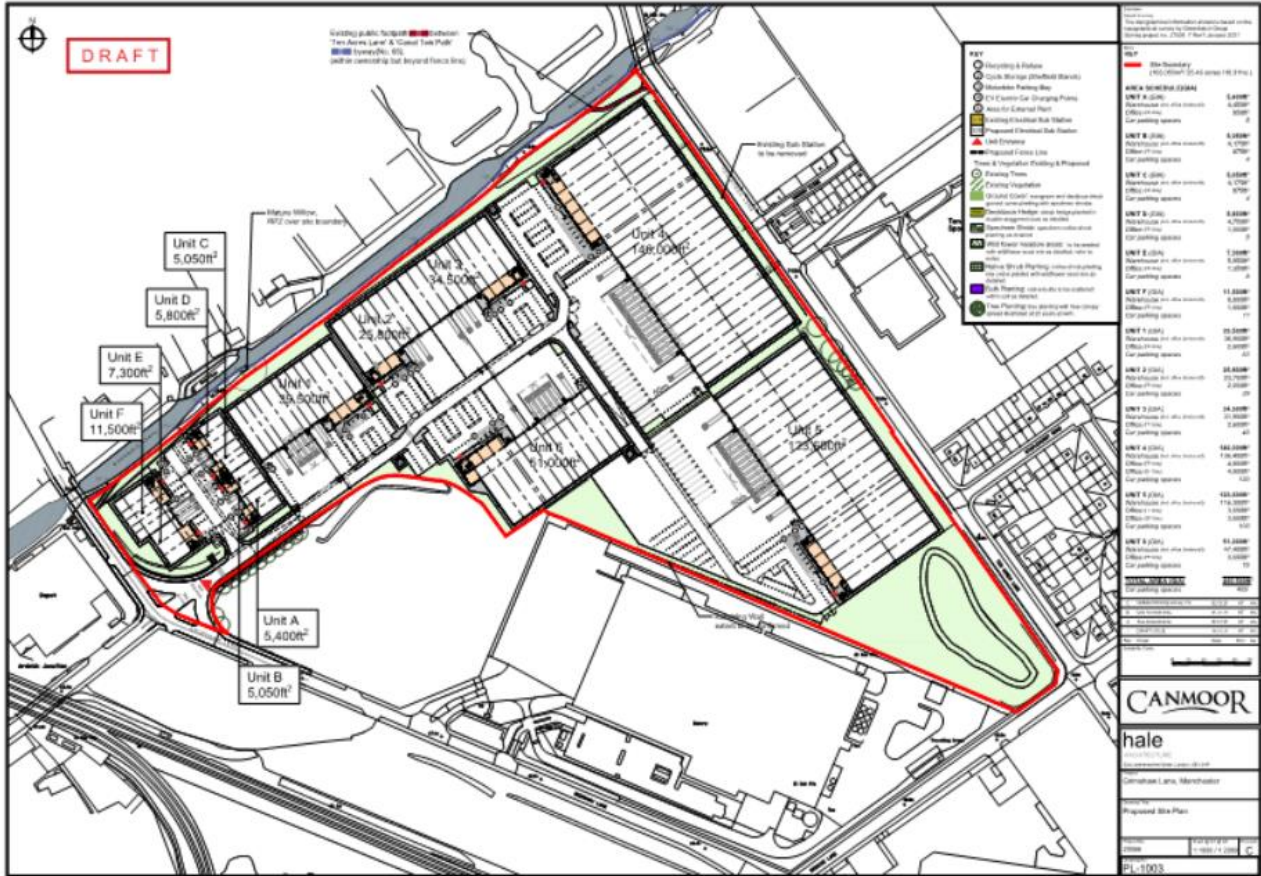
Proposed Development Site Plans. Drawing No. PL-1003. Source document Hale Architecture.
